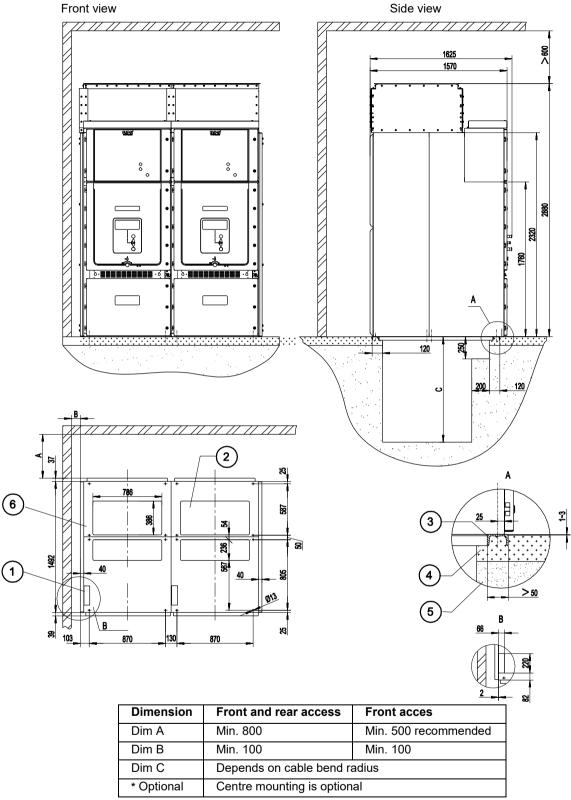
Basic floor plan for bottom cable entry panel rating 24kV 2000/2500A 25kA
